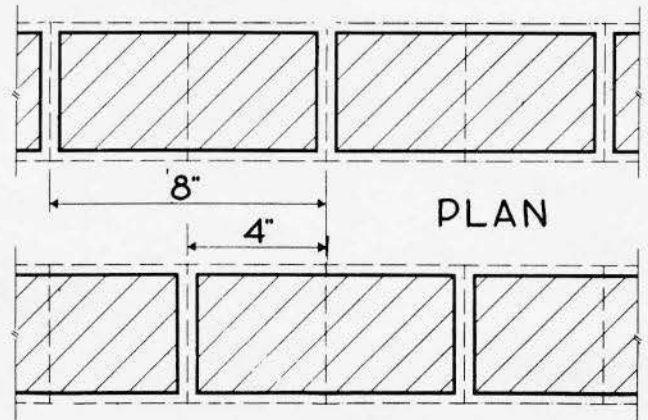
Masonry-wall dimensions showing brick plus joint unit.
